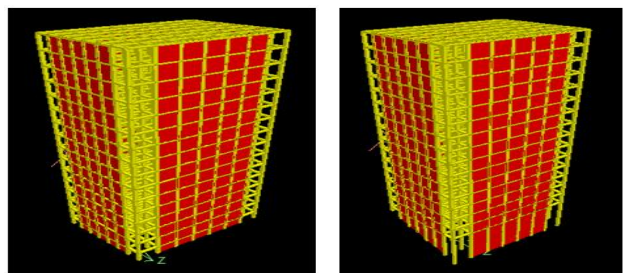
Building with straight shape shear wall on plain and sloping ground.
